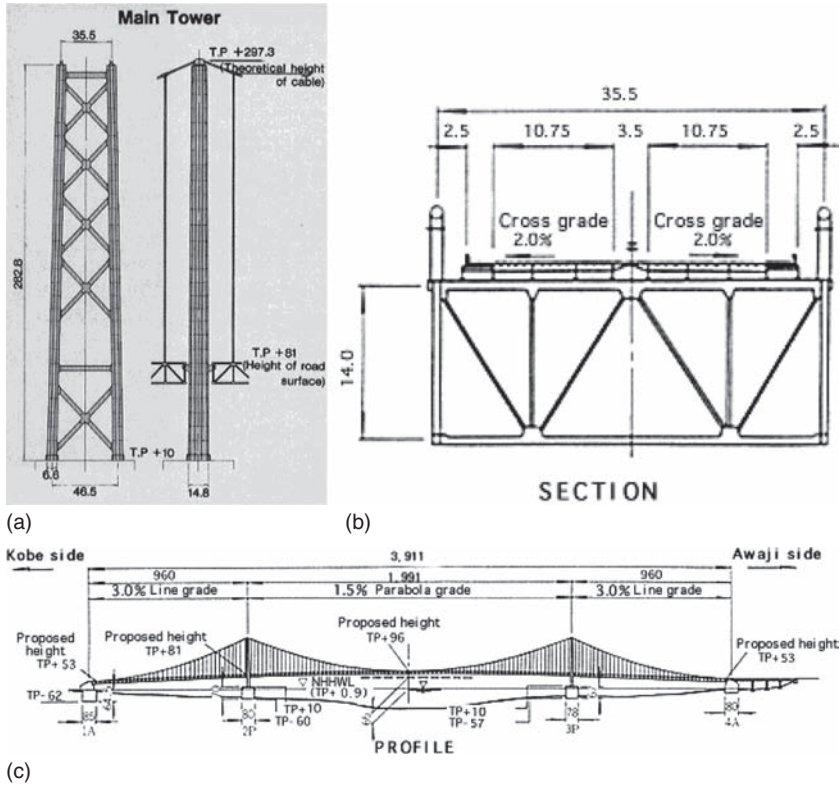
Tower, cross section, and elevation of the Akashi Strait Bridge.
